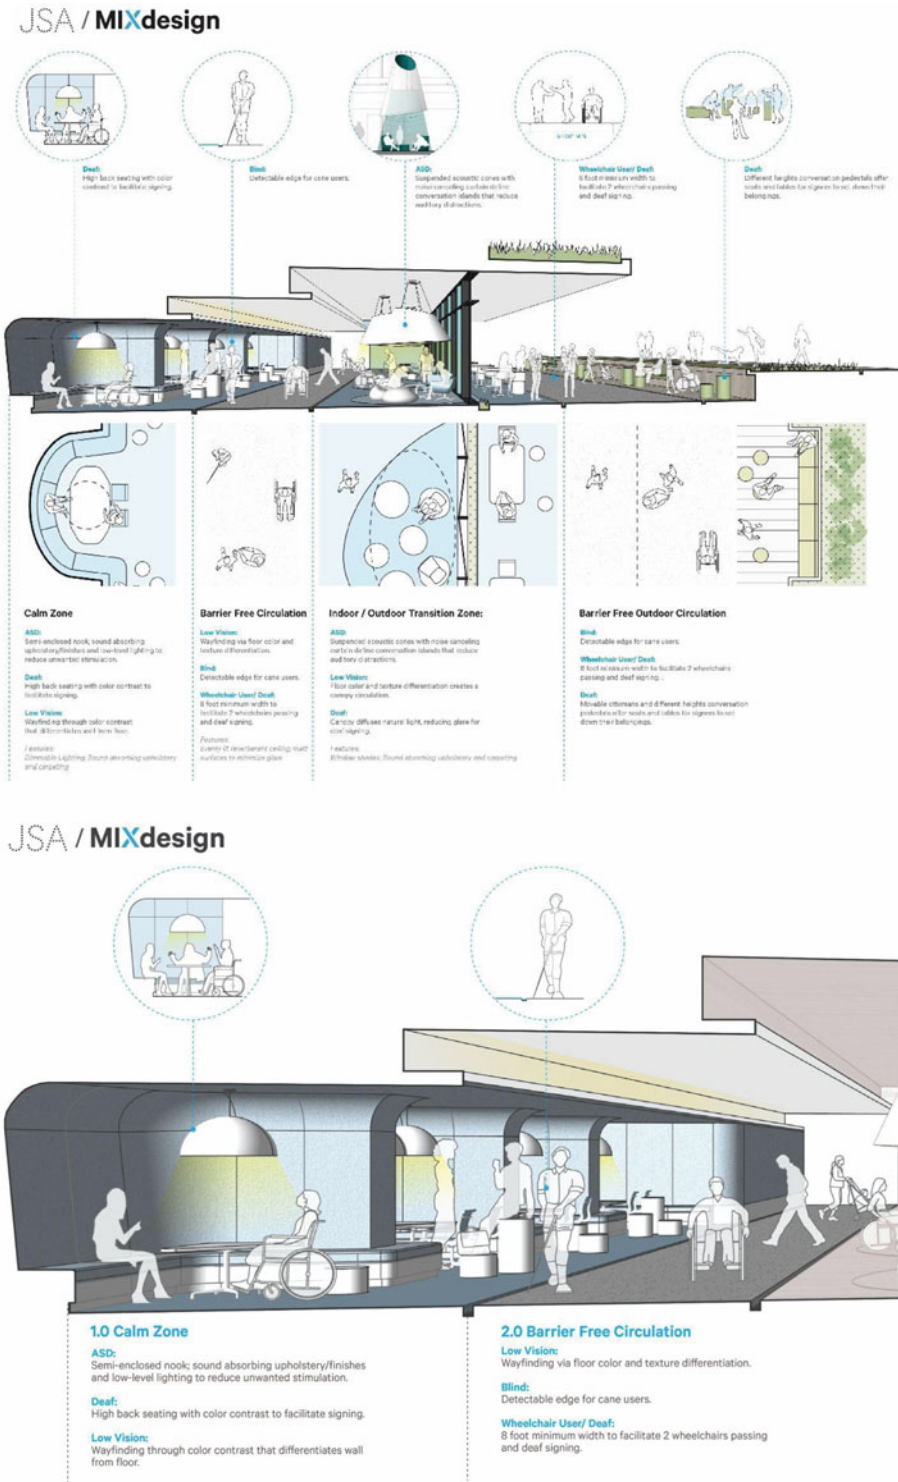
Educational building case study: Study Lounge, copyright JSA/MIXdesign, 2020
